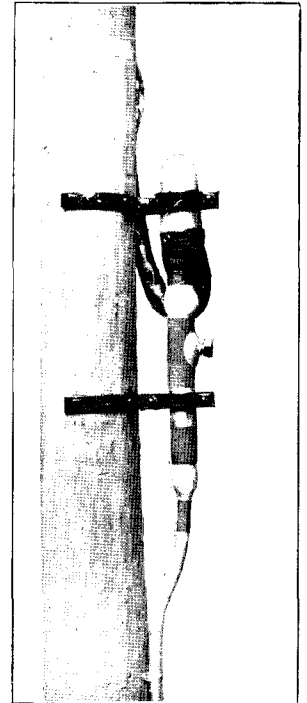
POT-HEAD MOUNTED ON POLE.
